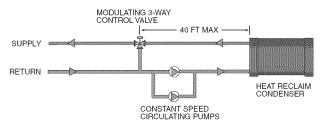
A — Three-Way Head Pressure Control Valve Location (Preferred)
